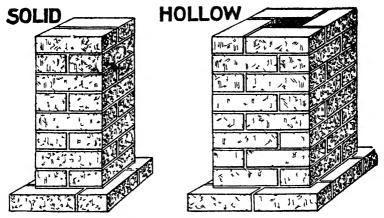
,362 and 4 363 -8×8 solid pier and 12×12 hollow pier
